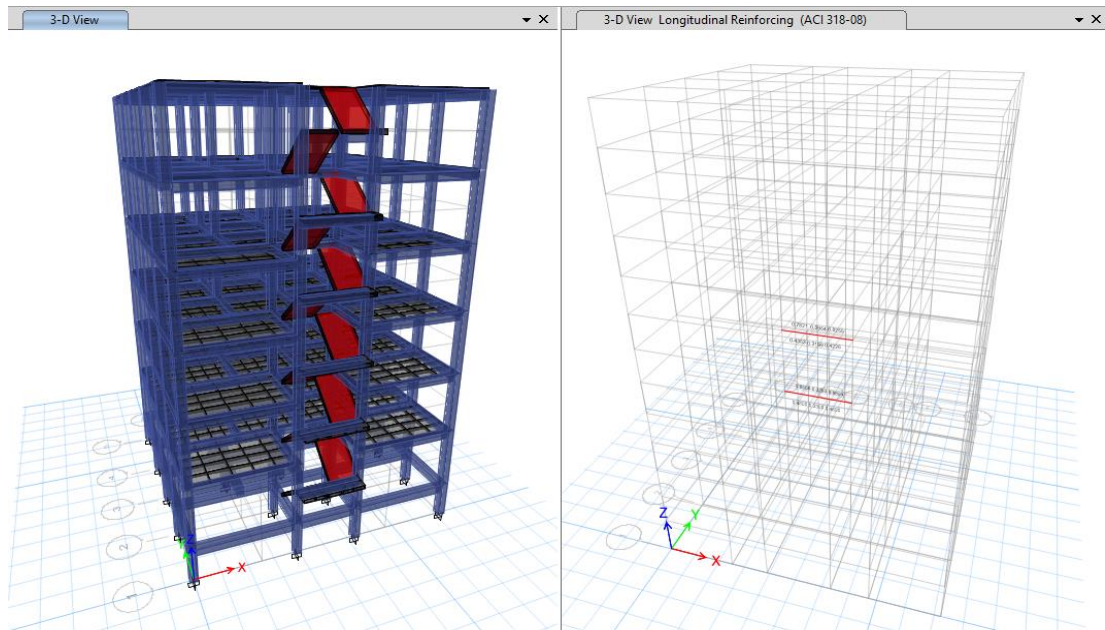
(G+6) story Residential Building with several beam failures in Dhaka district in zone 2
